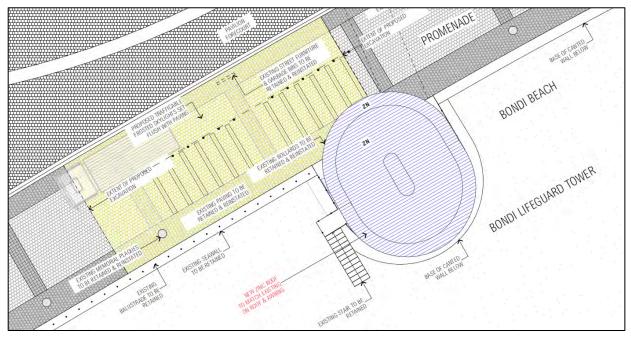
Approved site plan of Lifeguard Tower, Tunnel 2 and Amenities block.
